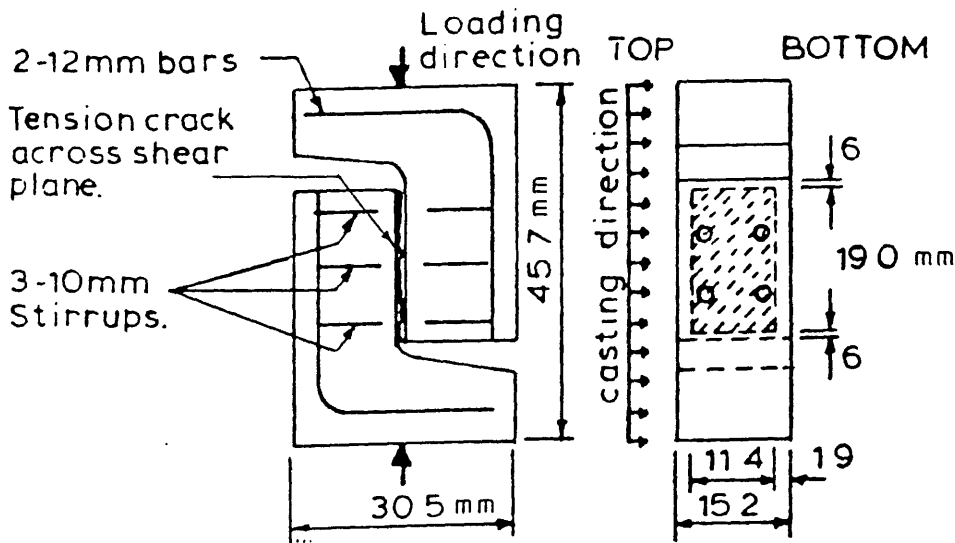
Typical test specimen used by Paulay and Loeber (11)
